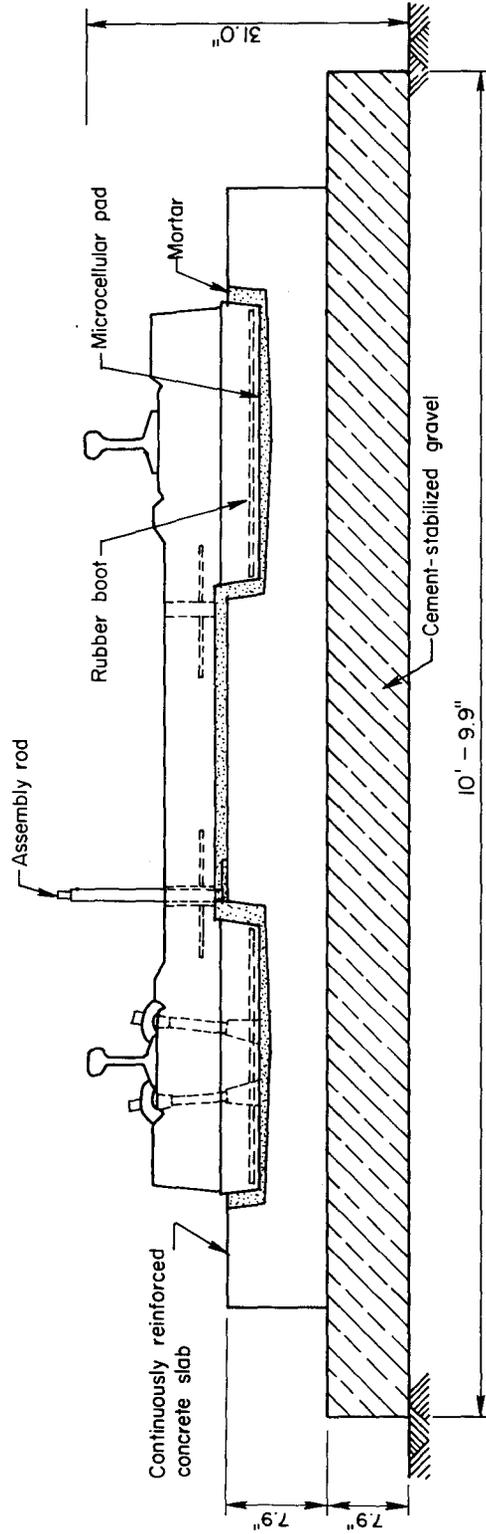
CROSS SECTION OF TRACK WITH RUBBER-BOOTED CONCRETE TIES SET INTO SLAB
